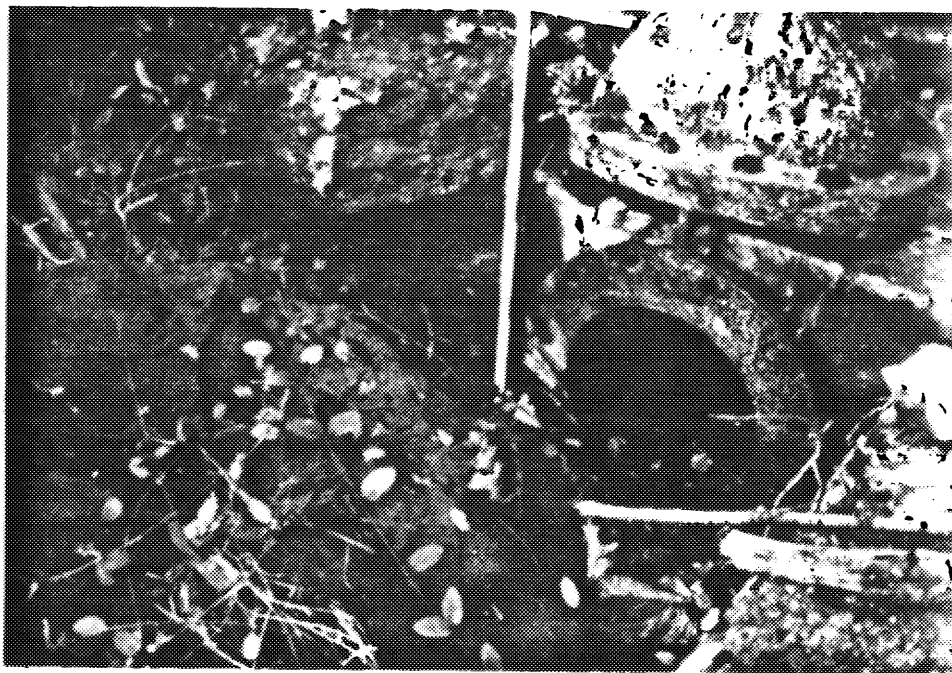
12" outlet valve below downstream weir. Note seepage to left of valve opening.
